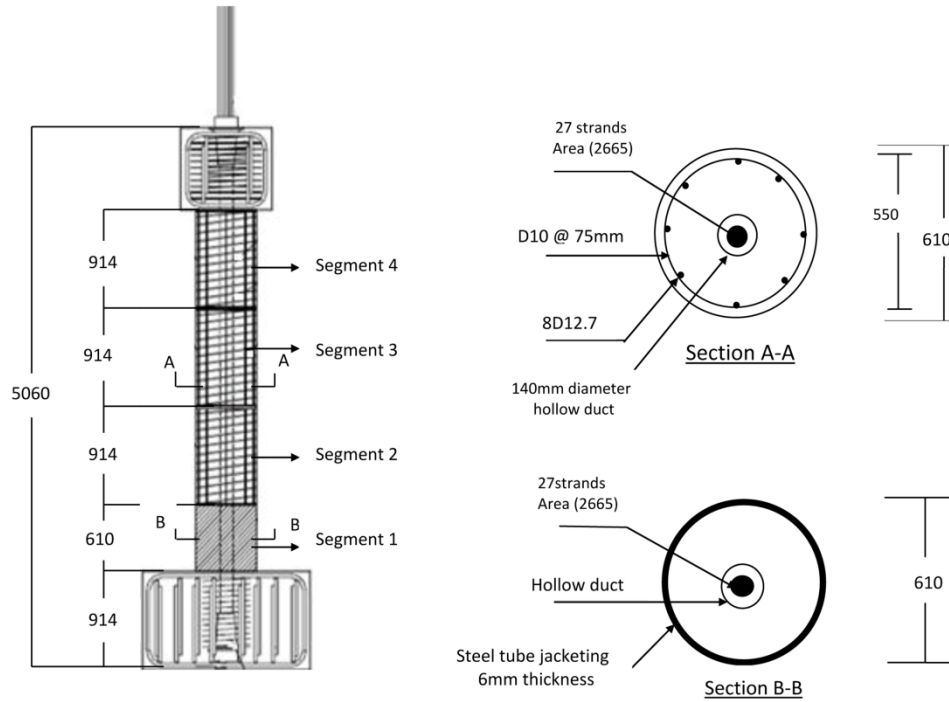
Unbonded precast segmental bridge column sample (Hewes and Priestley 2002)
